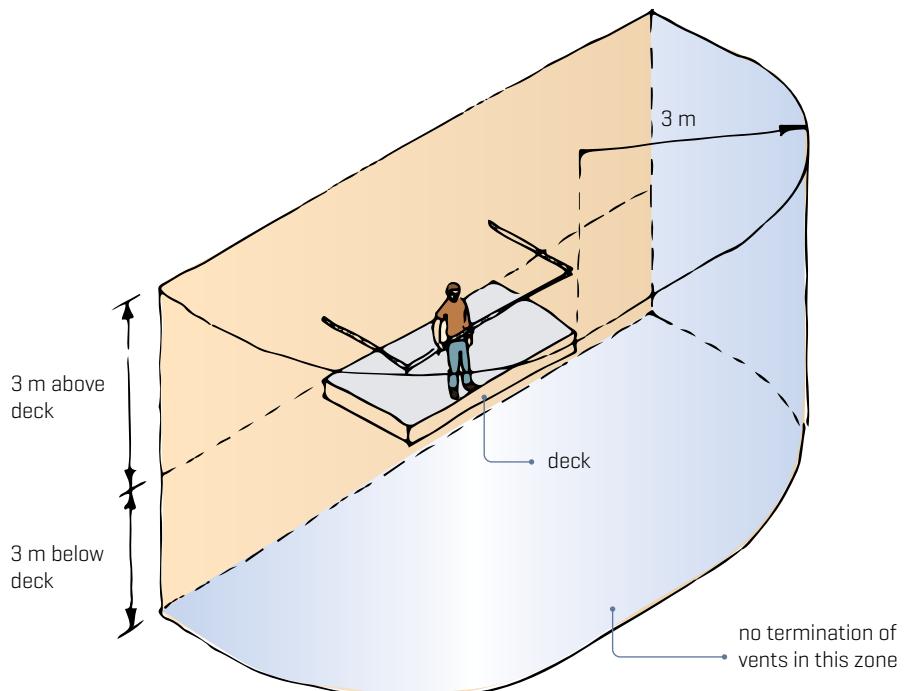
Termination point of vent 3 m above and 3 m horizontally from a deck.
